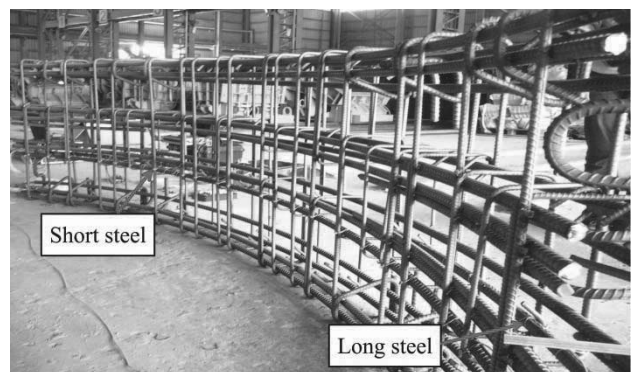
A fully assembled reinforcement steel cage for A1 panel.
